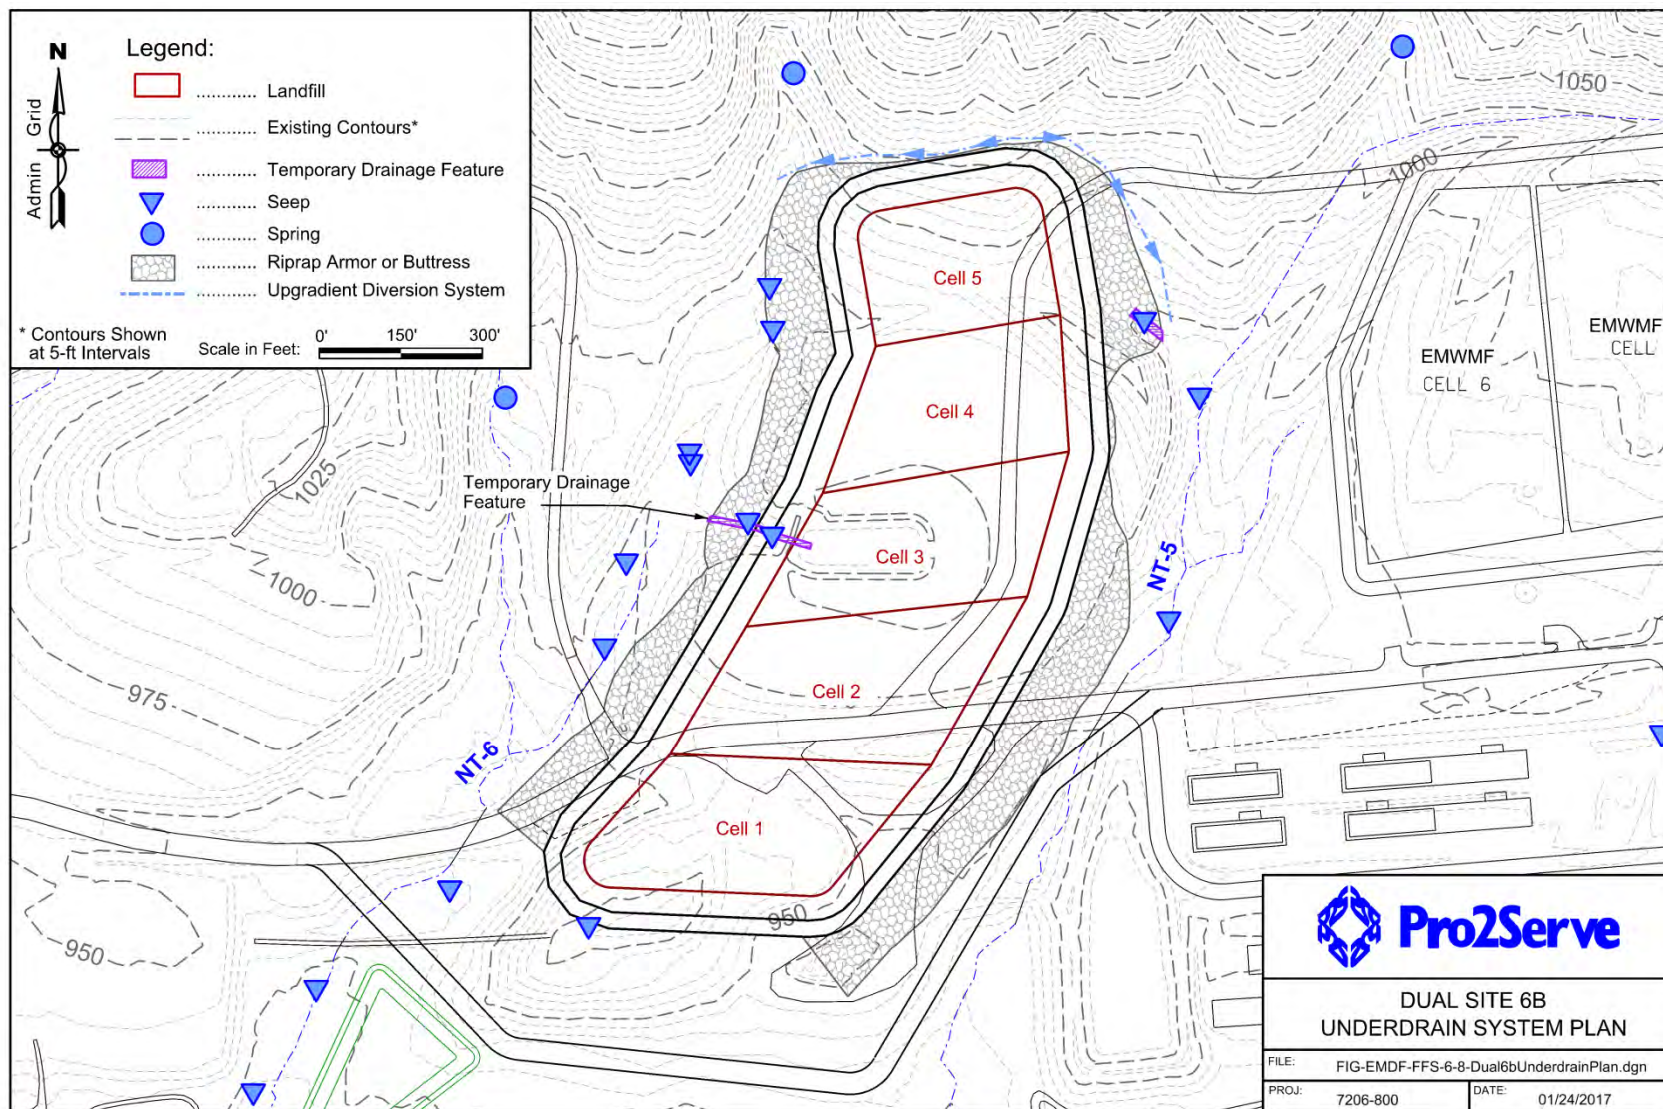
Dual Site (and Hybrid Alternative Site), Site 6b, Drainage System Plan
